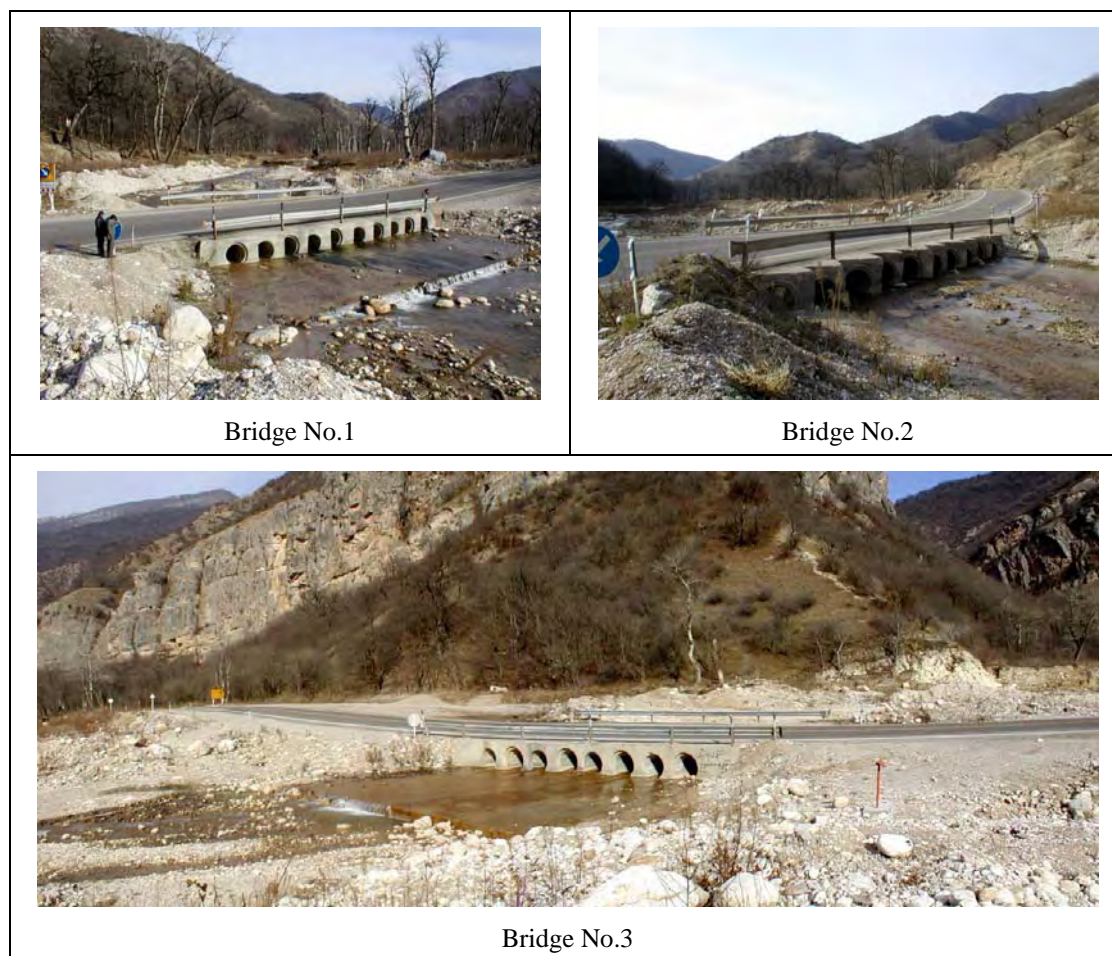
(1/2) Submerged Bridges in the Golestan Forest
